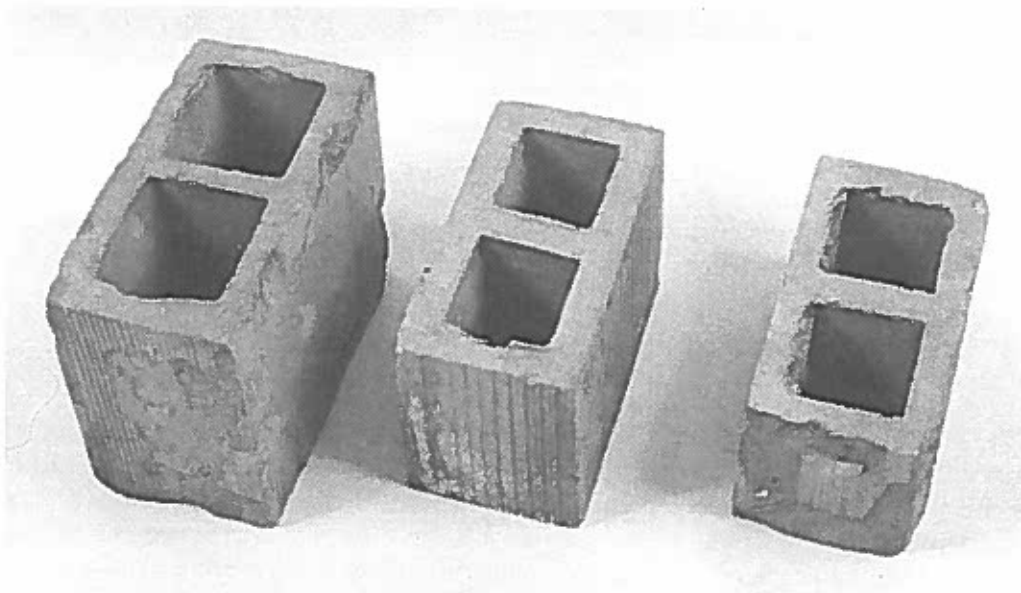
Medium and Small Sizes of Hollow Building Blocks (Specimens A-7, I-9, and I-10).
